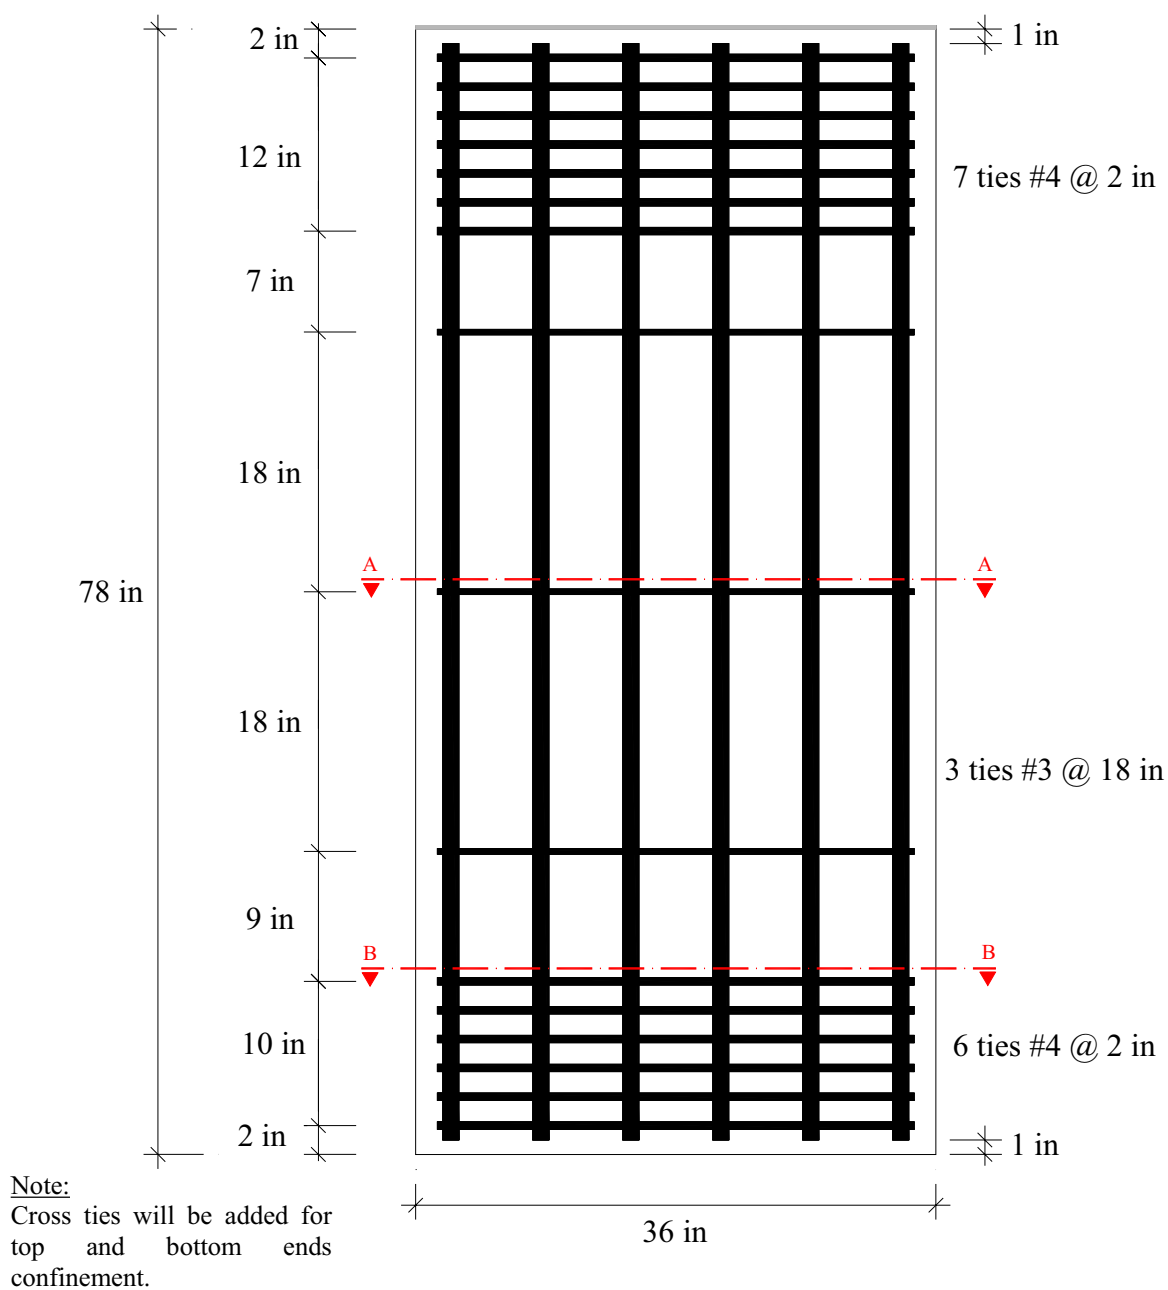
Longitudinal Cross Section; Specimens G1 & G2
